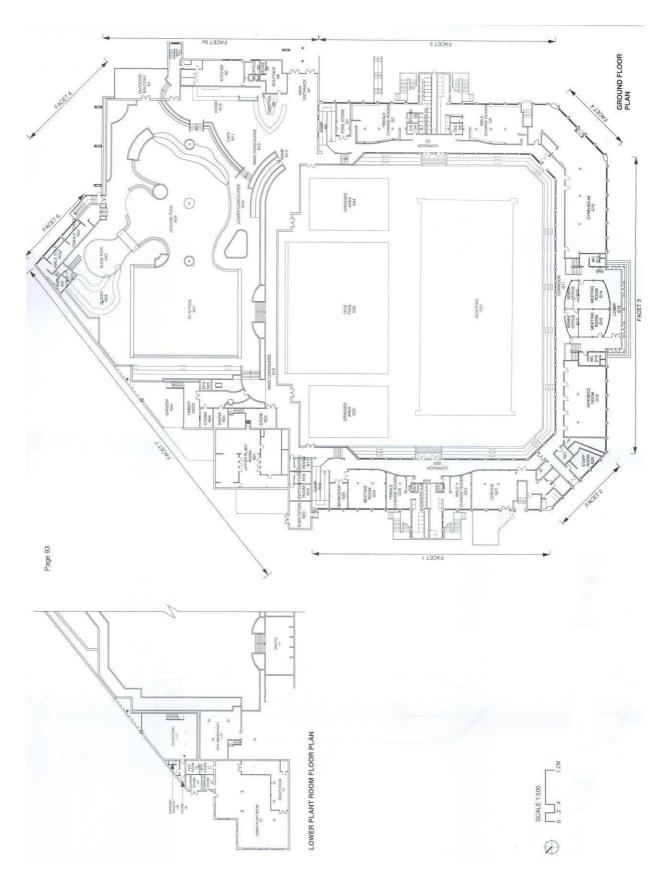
Beatty Park Leisure Centre – Ground Floor Plan.
